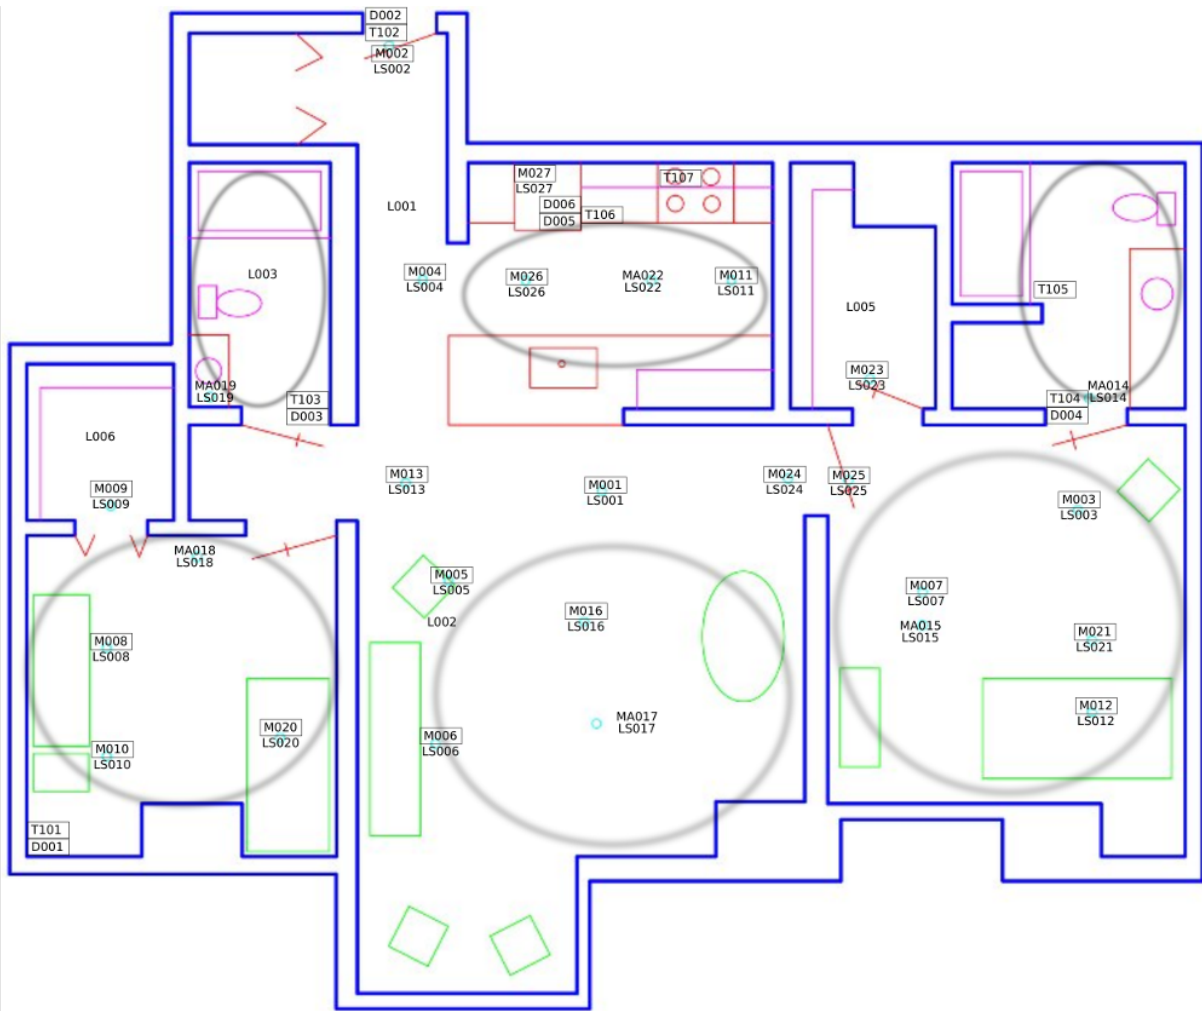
Floor plan and sensor placement for the testbed hh104.
